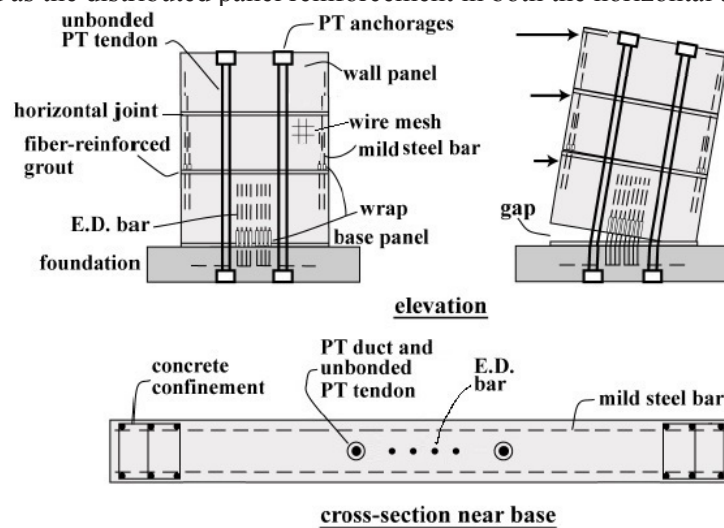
Elevation of exaggerated displaced position, and cross section of hybrid wall system
